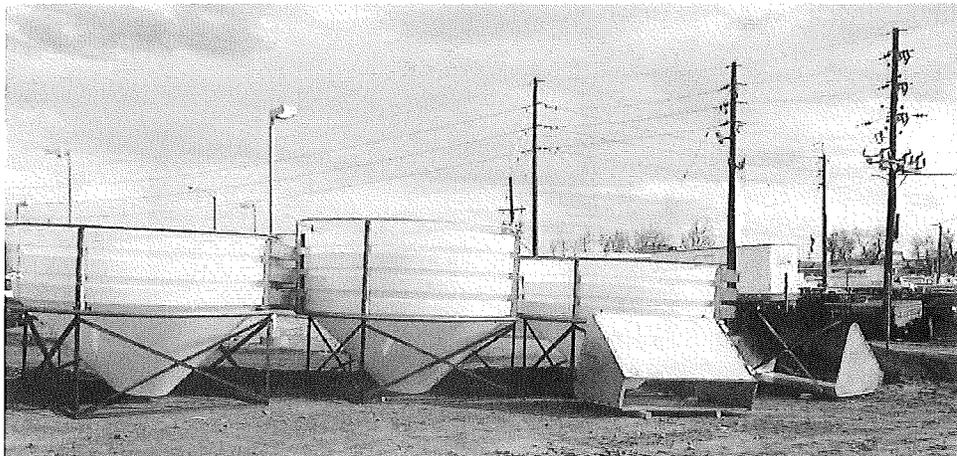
Photo of Gravity-Plate-Type Settler for Grit Removal
